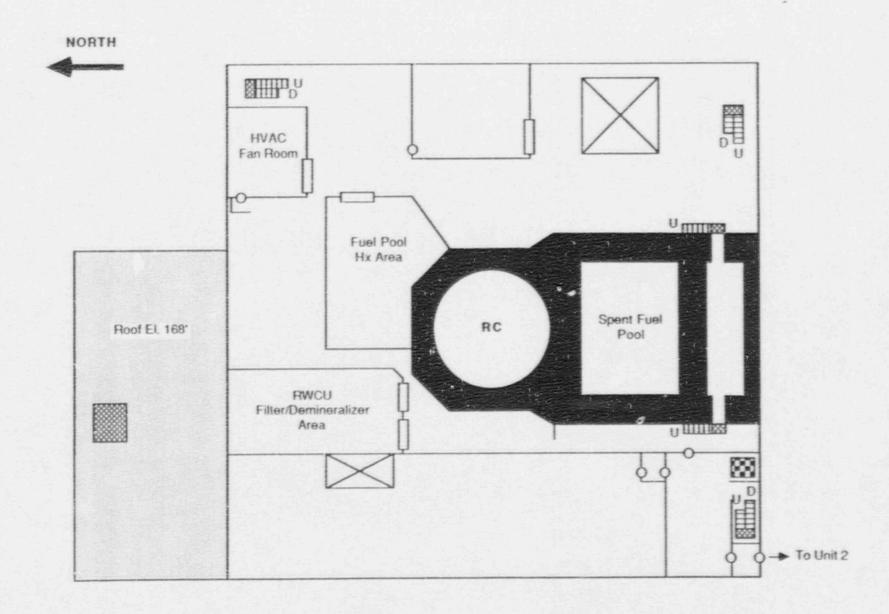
Hatch Unit 1 Reactor Building Arrangement - Elevation 185 ft.
